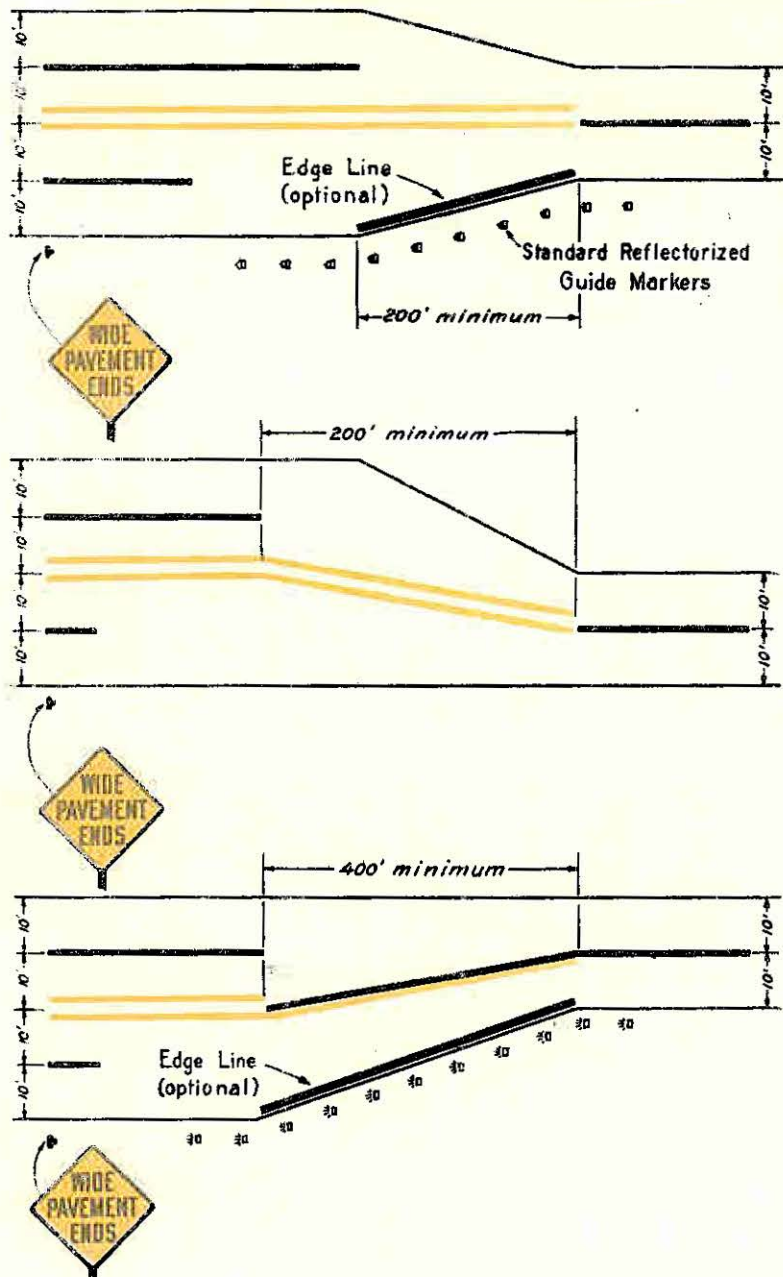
c - STANDARD PAVEMENT MARKINGS
